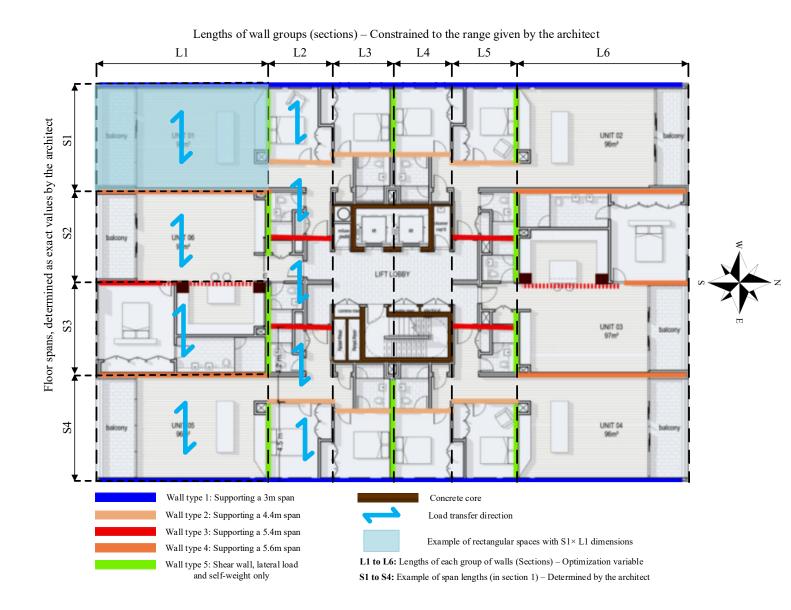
Example floor plan with a one-way spanning floor system (adopted from Woodard and Jones [162]
